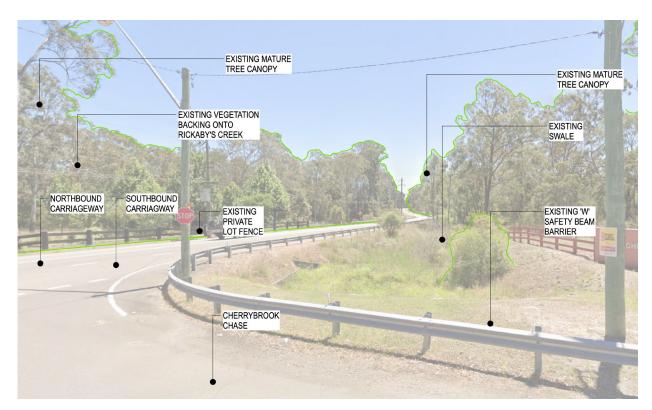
Viewpoint 7 - Intersection of Londonderry Road and Cherrybrook Chase (facing north) - Existing view
